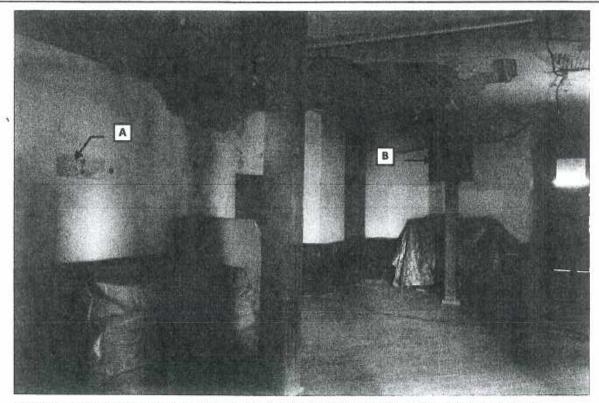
Basement Stair Hall view southwest. (A) Ghost marks of fire hose mount, (B) Coal Room viewport.
